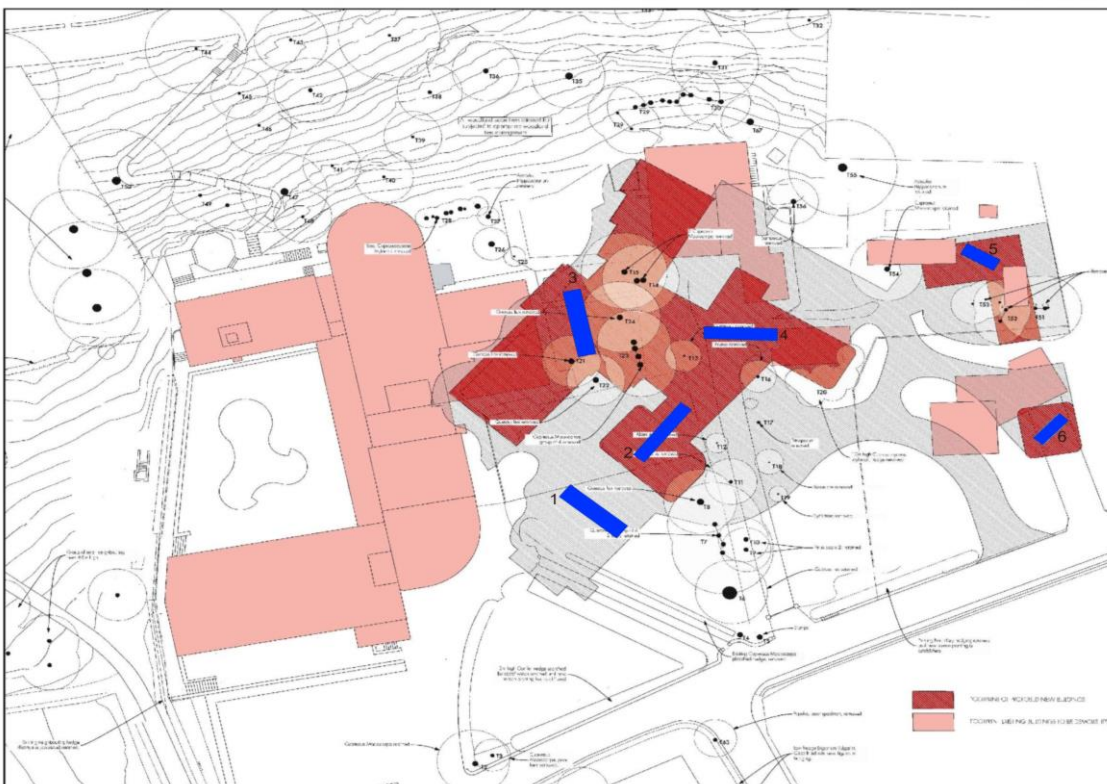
Trench Location Plan © Main Graphic Godel Architects
